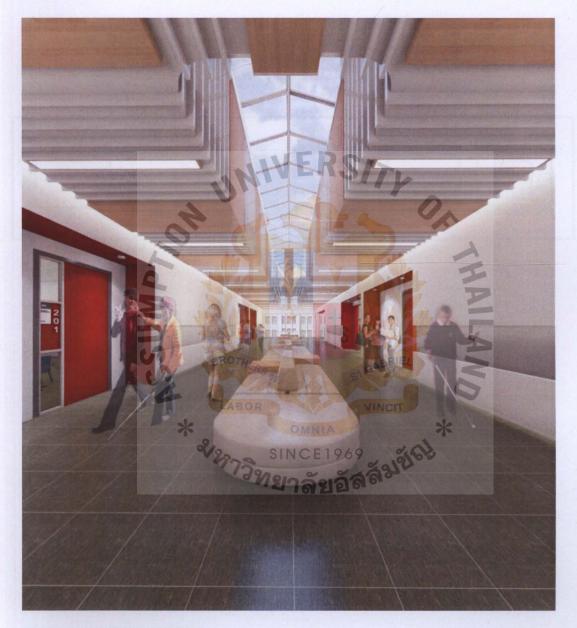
HALLWAY/ CORRIDOR
